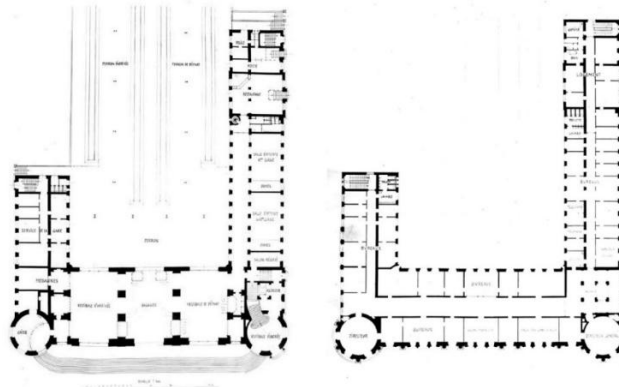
Ground and First Floor Plan drawings of Haydarpaşa Train Station (Frankfurt Institut für Stadtgeschichte Archive, as cited in Kösebay Erkan, 2013, 106).
